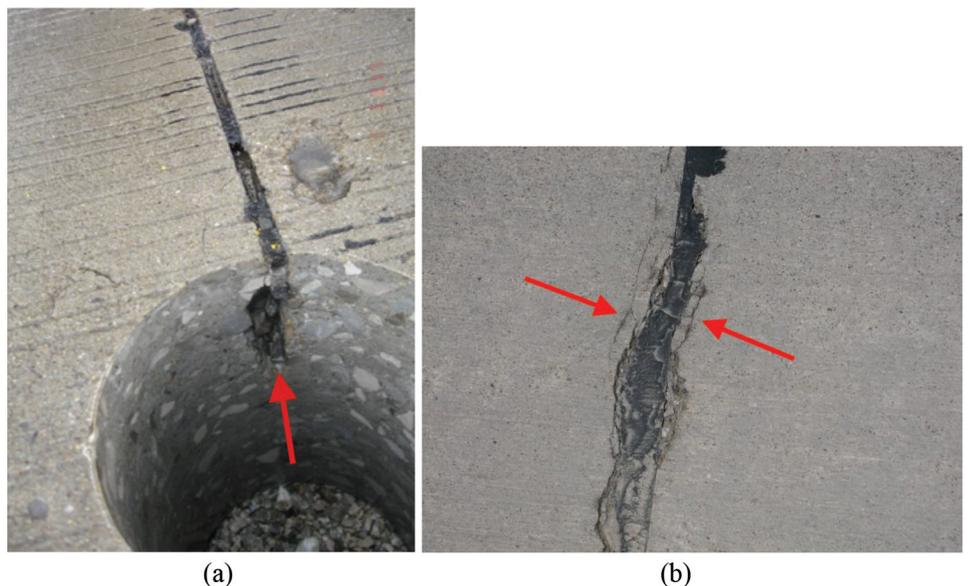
Photographs showing: (a) damage at the base of a saw cut (red arrow) that leads to cracks parallel to walls of joint (Arribas-Colón et al. 2012); and (b) flaking of the concrete (red arrow) that presents itself as raveling along a joint (photo courtesy of L. Sutter).
